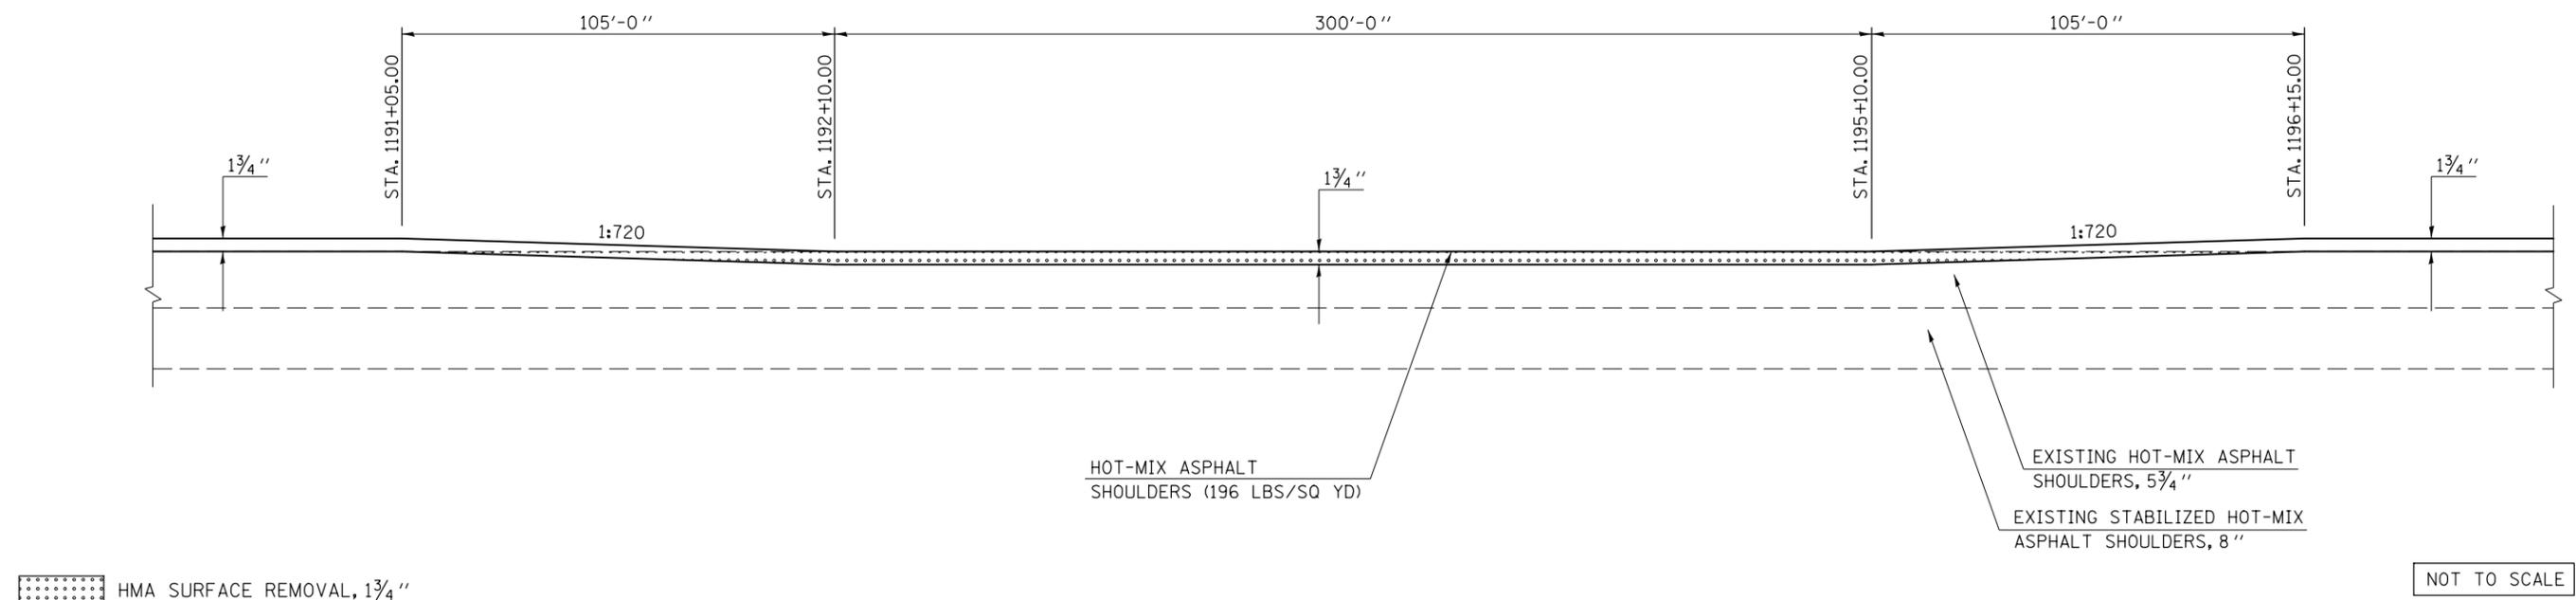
MILLING & PAVING TRANSITIONS UNDER S.N. 057-0130
